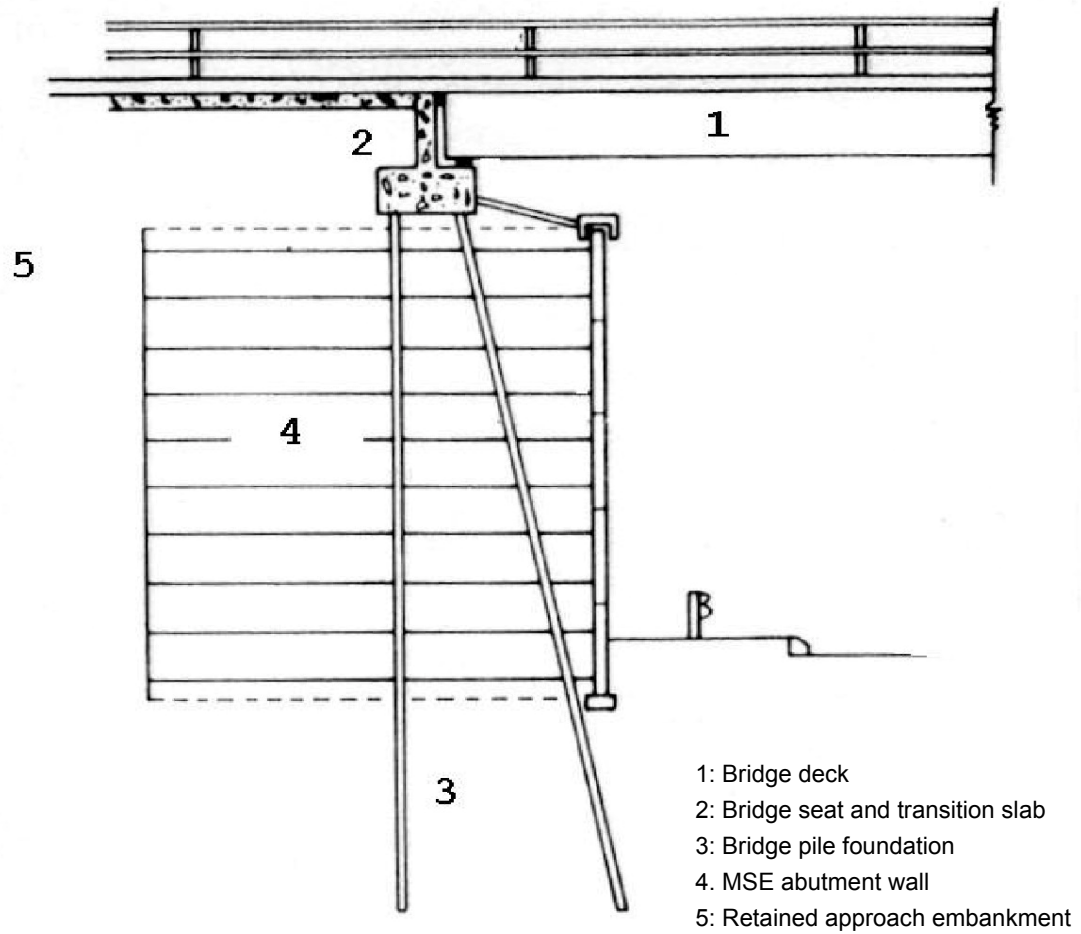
Conventional design of MSE abutment wall (from Jones, 1996)
